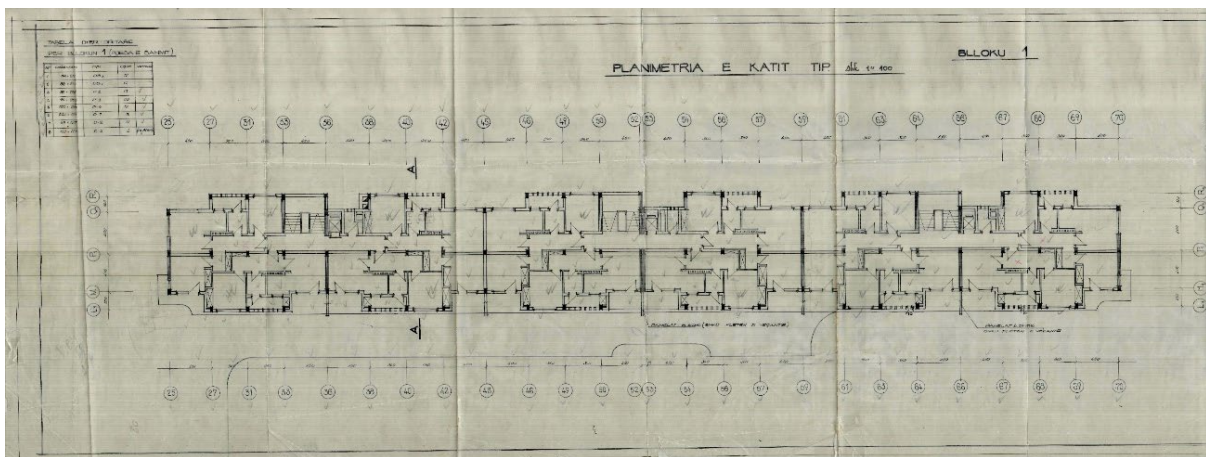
Typical Floor Plan of One of the Apartment Blocks of Residential Complex by Faik Alimehmeti (AQTN).
